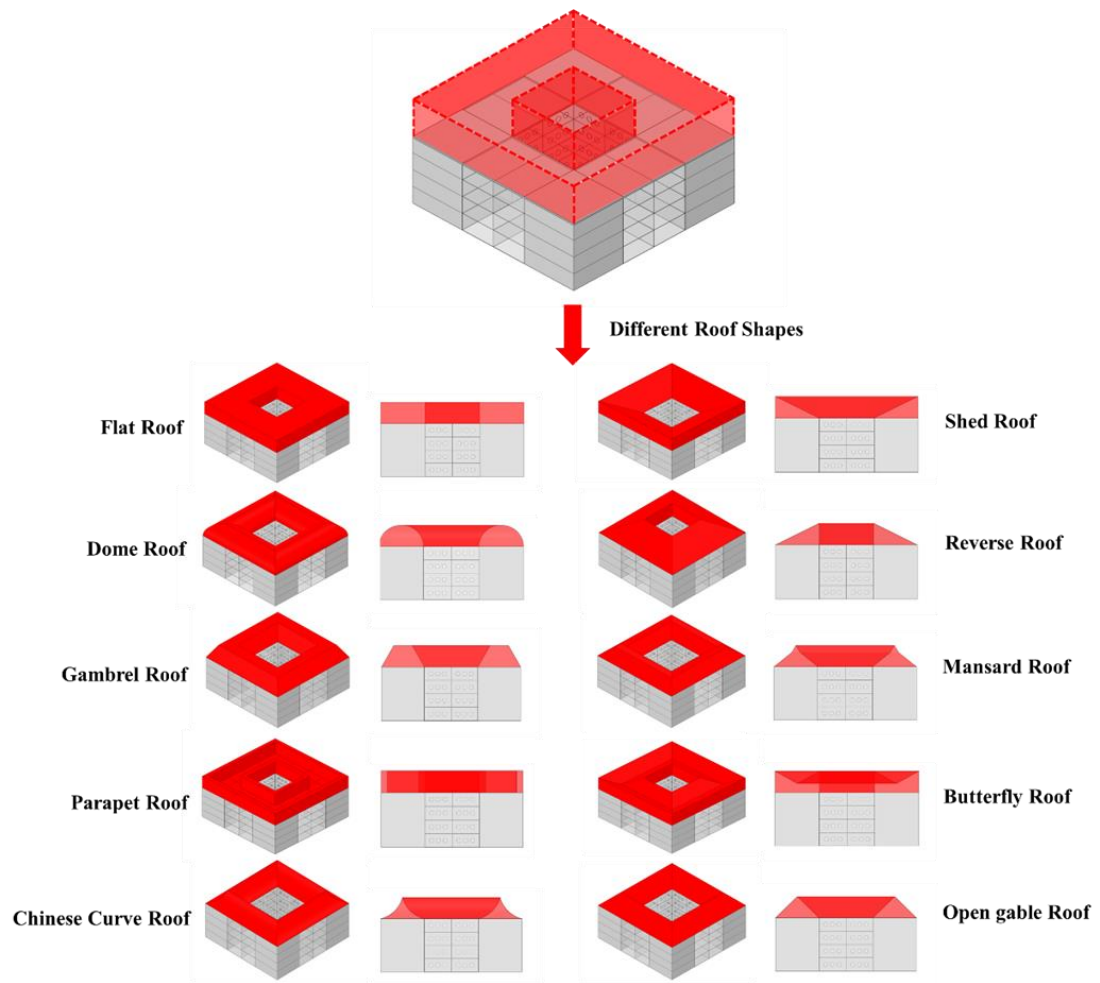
Single-sided ventilated courtyard buildings featuring ten different roof styles.
